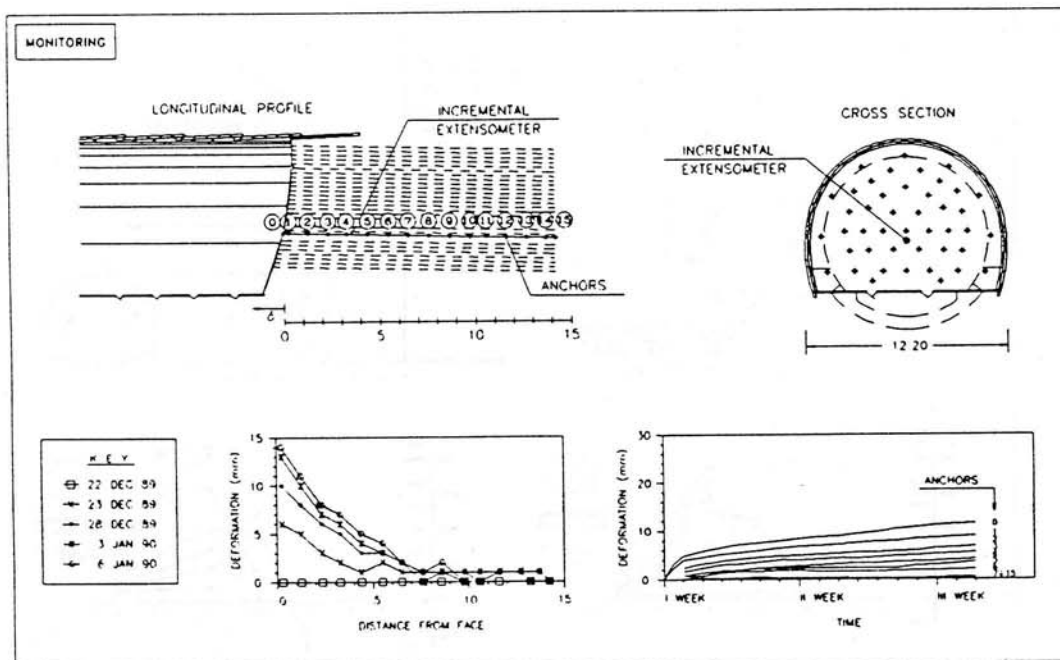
Measurements of deformation at the tunnel face («Talleto» and «Caprenne» Tunnels)
